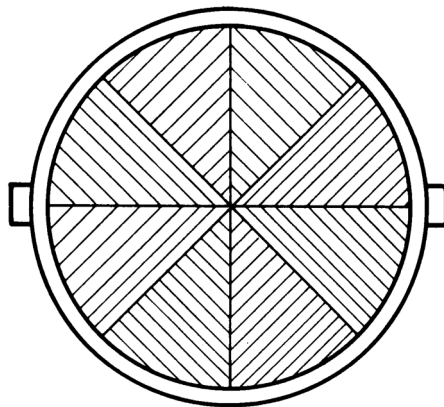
EXCAVATION PATTERN BENEATH CAISSON
